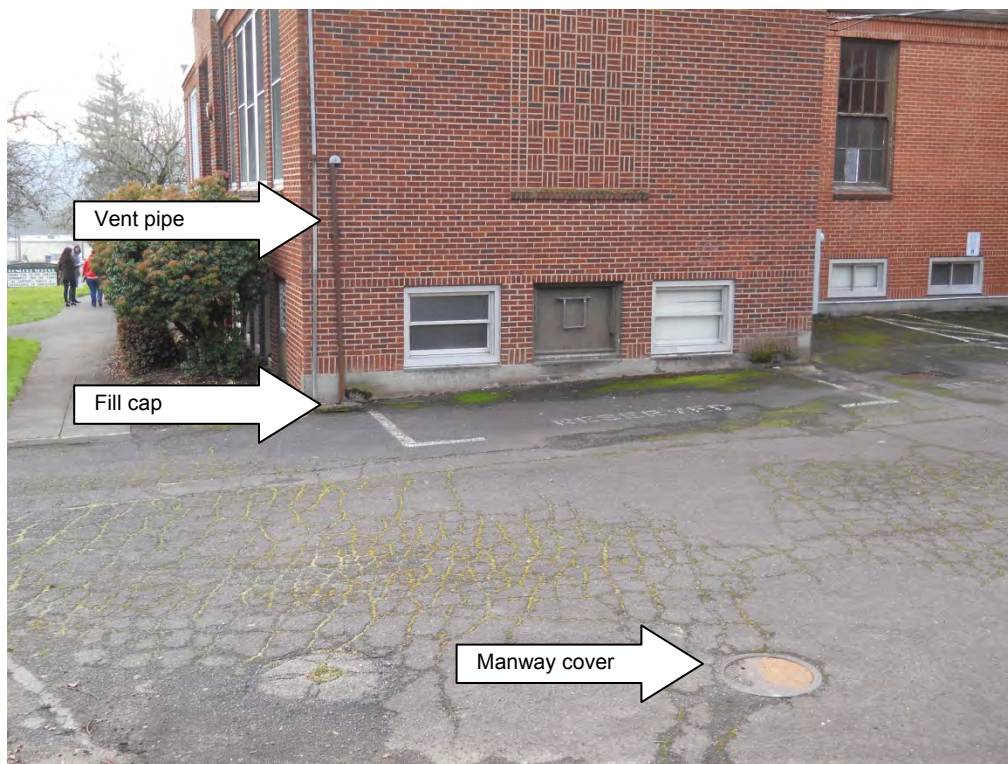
Vent pipe, fill cap and manway cover located at the southeast corner of the school
